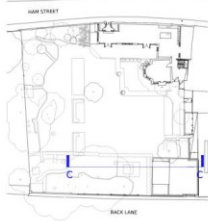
Proposed outbuilding plan (reproduced courtesy of the client).
